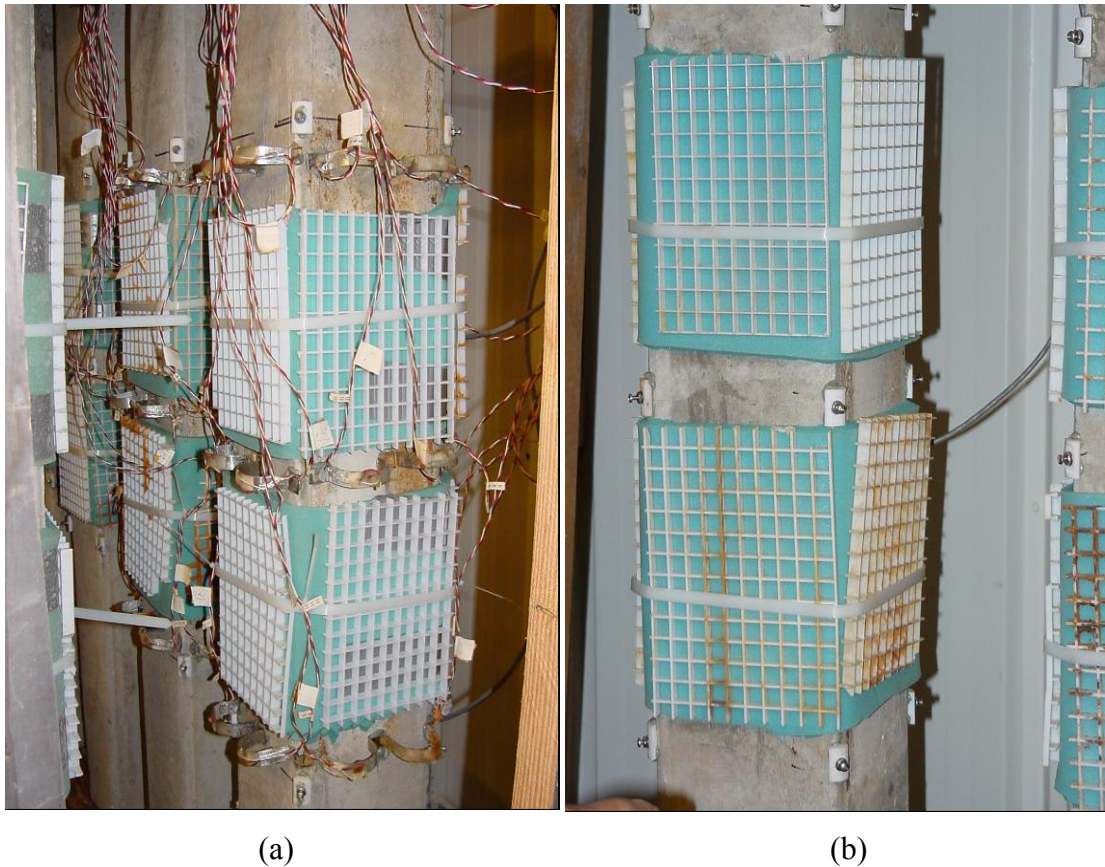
(a) 24 Crack Gages and 2 Strain Wires at #7 and #8 Specimens; (b) Three Strain Wires at #5 and #6 Specimens
